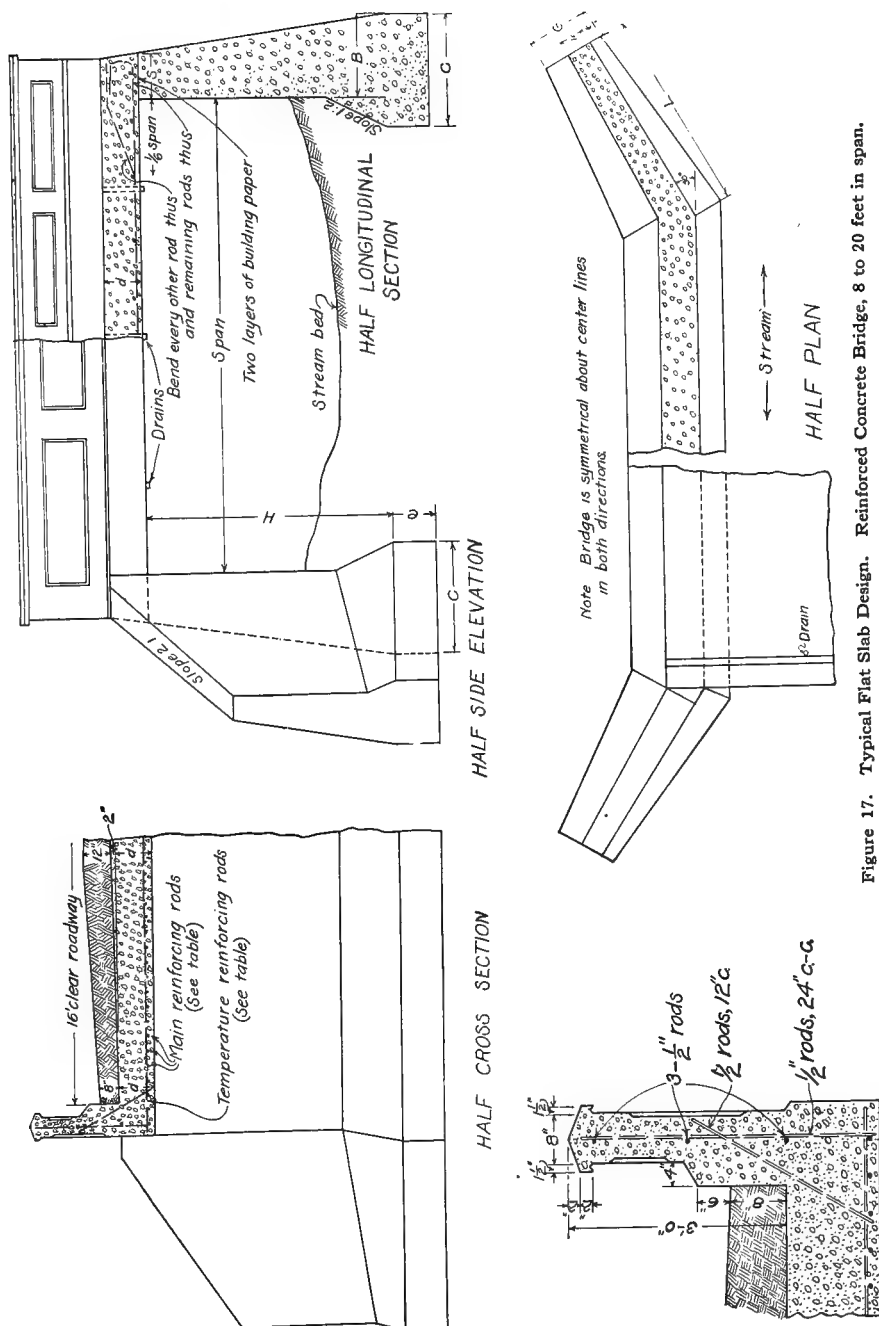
Typical Flat Slab Design. Reinforced Concrete Bridge, 8 to 20 feet in span.
